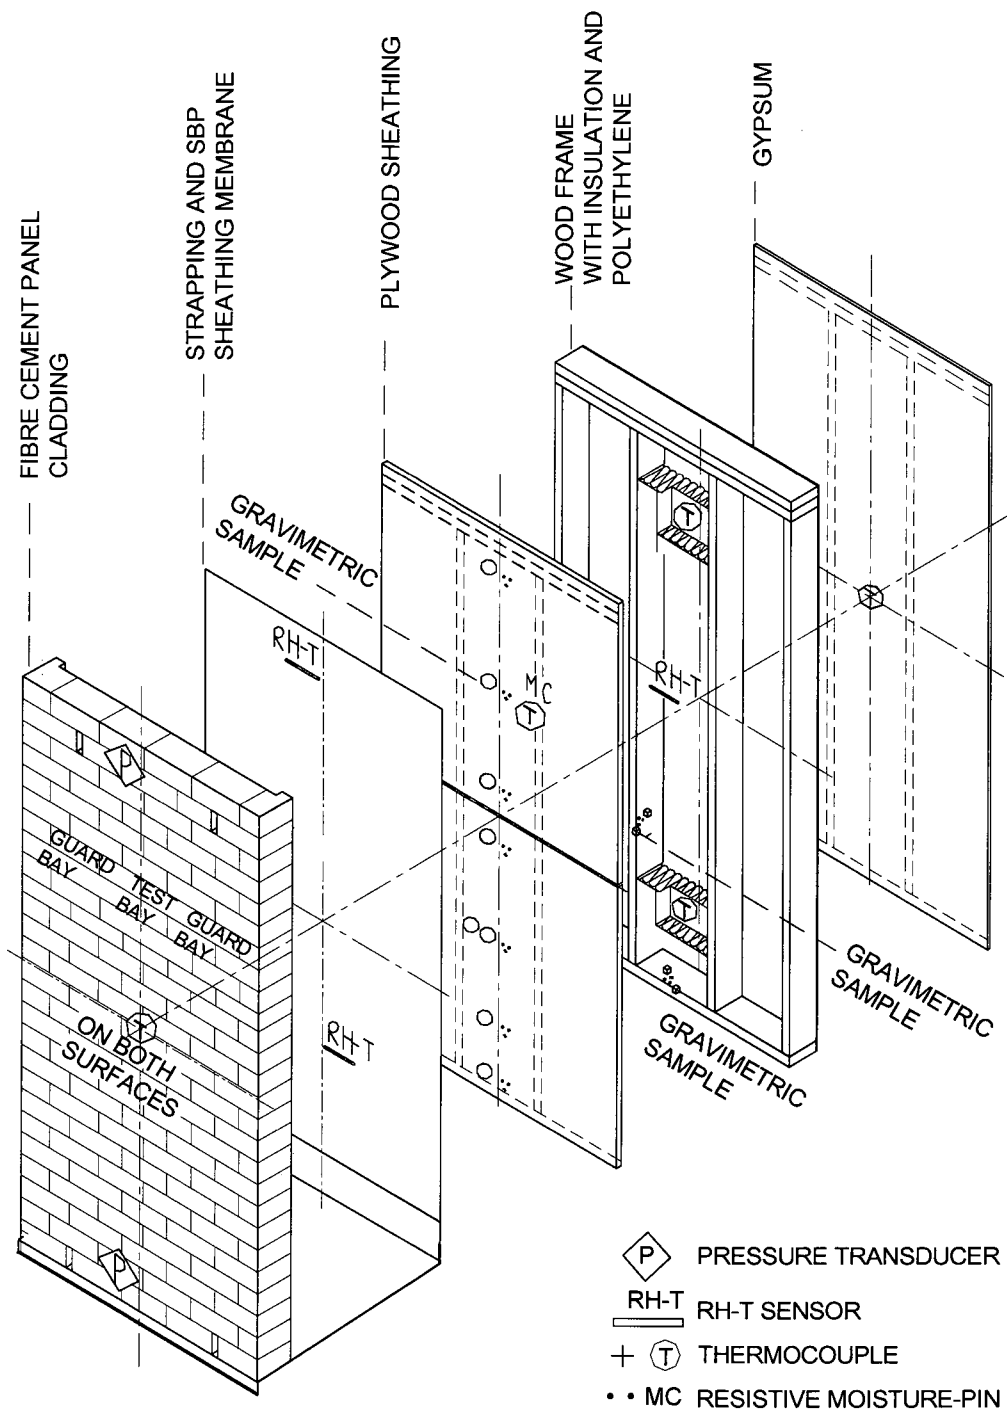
Layout of gravimetric samples and electronic sensors in a typical brick wall specimen.
